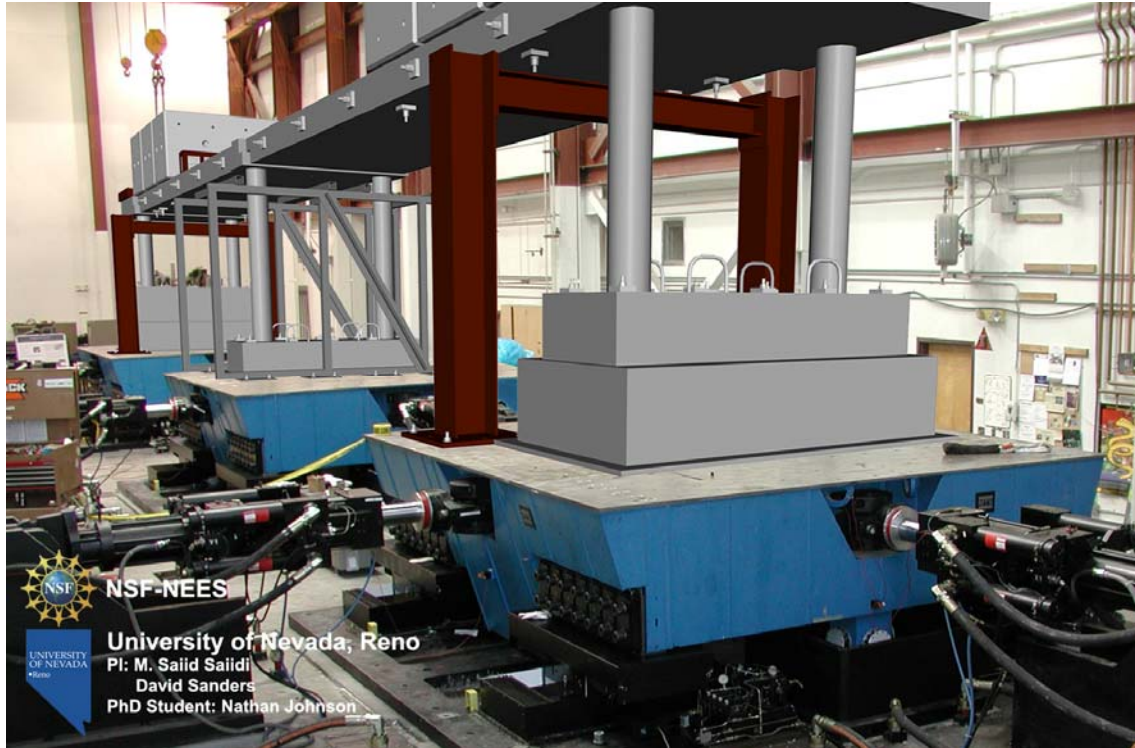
Rendering of bridge specimen superimposed on shake tables.
